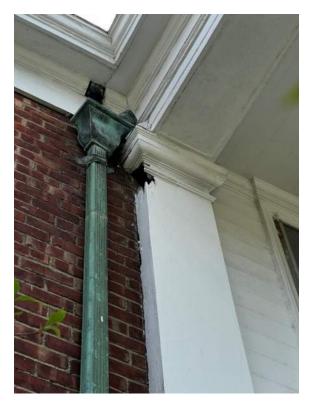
IMG_1151 – North Façade (North East of front entrance) - Internal downspout to collector box is dislodged, allowing water to drain onto brick masonry and wooden elements.
